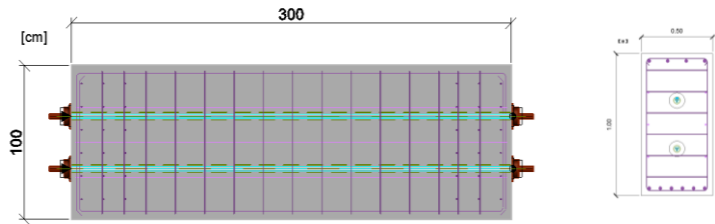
Geometry of prestressed concrete beams (prototypes 1 and 2)
